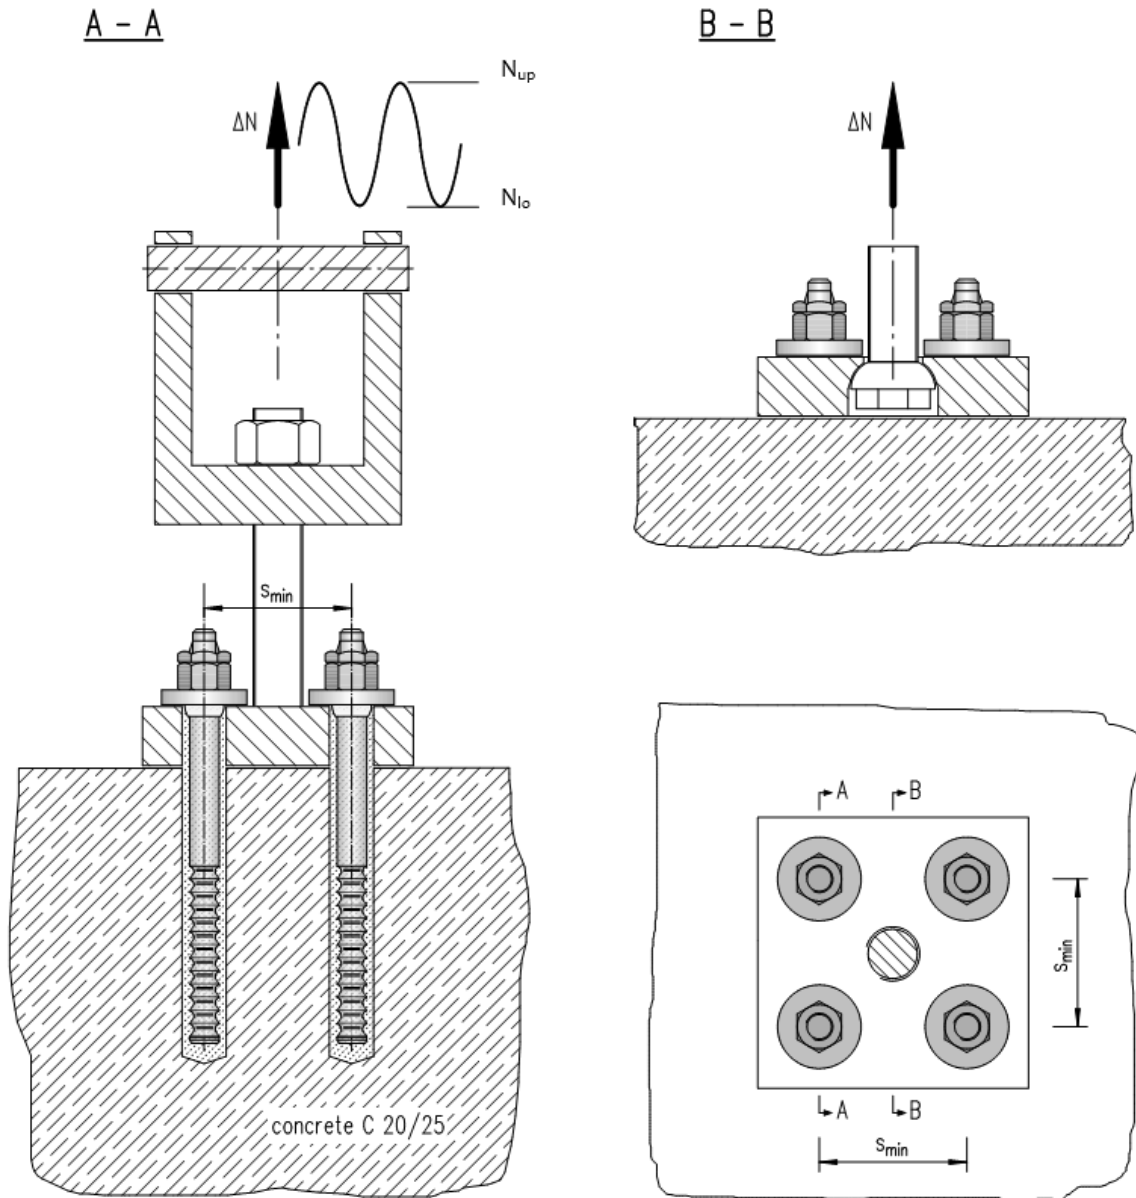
Example of test setup for concrete cone failure under tension in uncracked concrete
